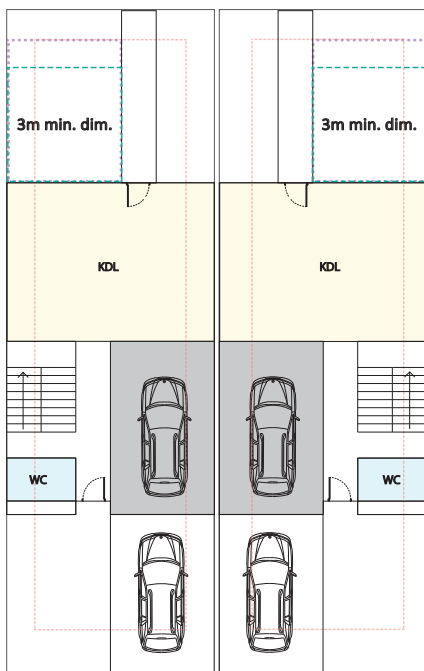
Floor plans for type TH1 - Refer fig 71,72 (page 60) for further details
